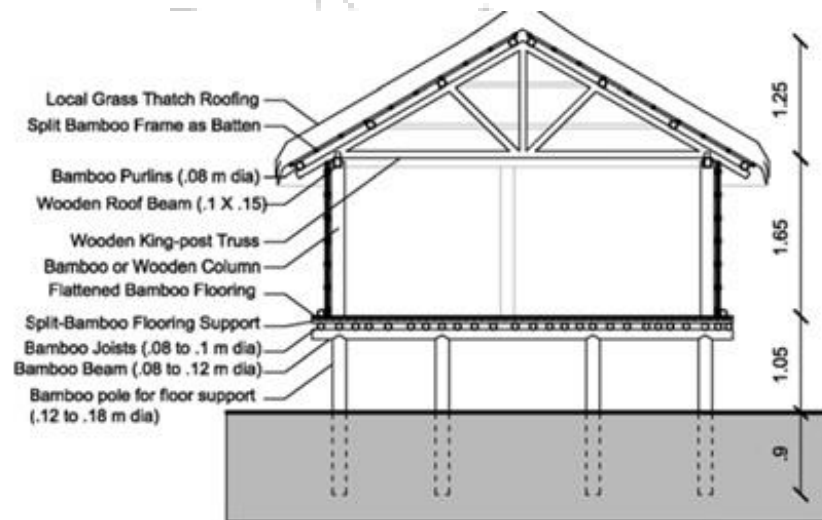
Measure drawing of a typical Bamboo House on stilts
